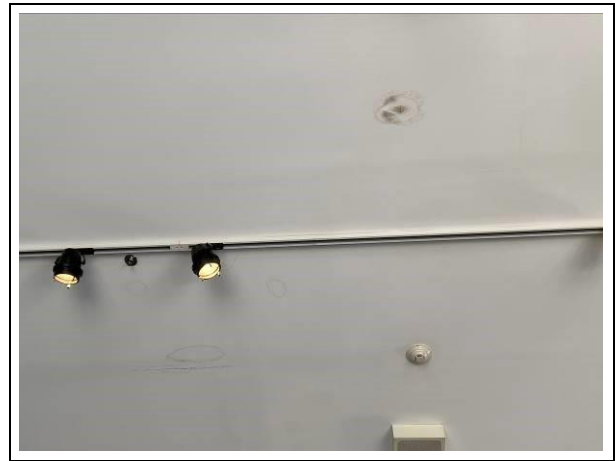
Water Damage and Typical Observed on First Floor Ceiling
